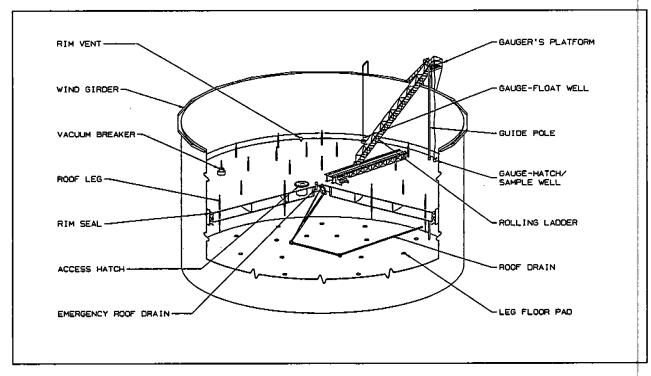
Typical External Floating-Roof Tank (EFRT) With a Double-Deck Floating
